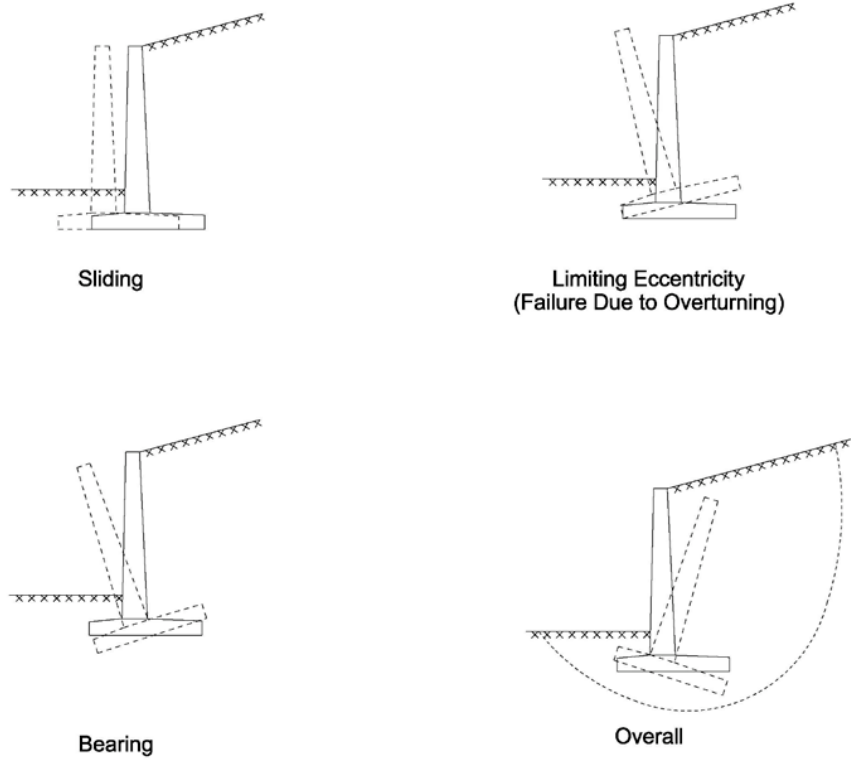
External Stability Failure of a CIP Semi-Gravity Wall
